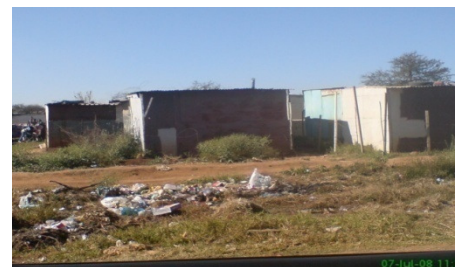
and 6.18 Image by author, 2008. The language of mono-pitched roof and corrugated sheeting structures are dominating in the area.
